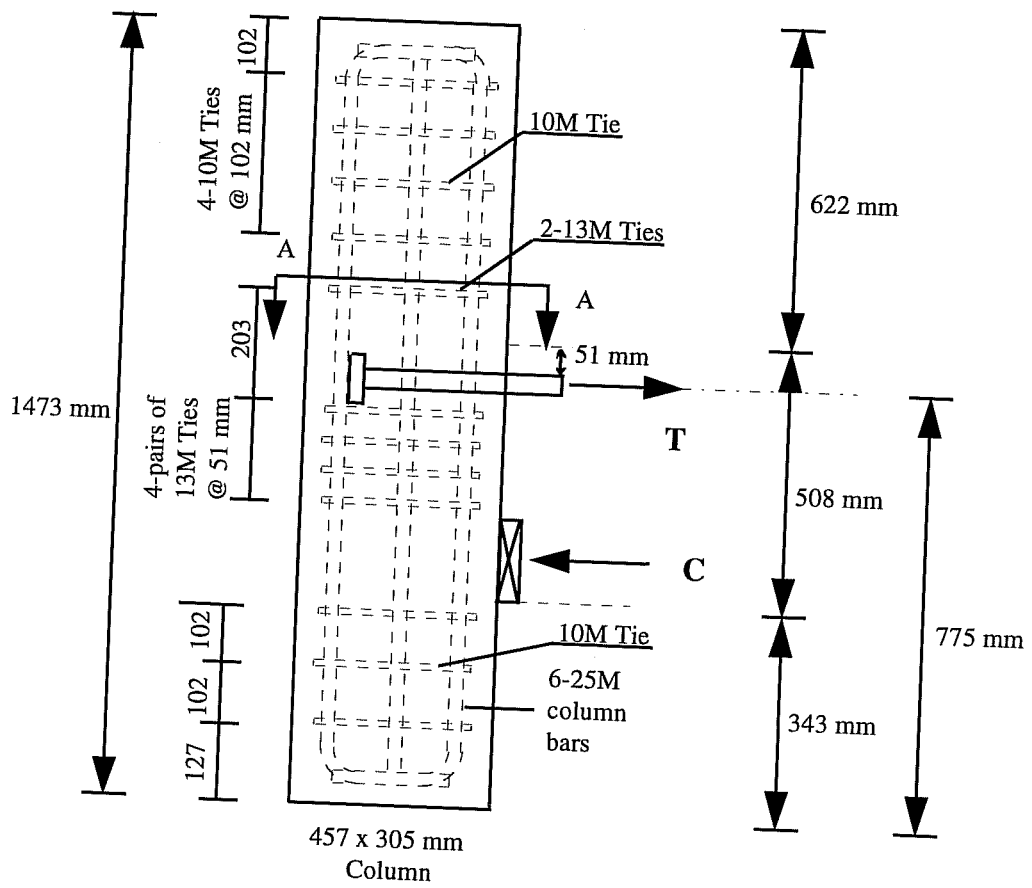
Reinforcement details - Specimens T15, T18, and T19
